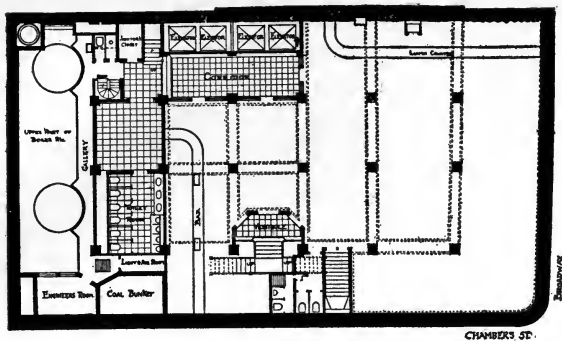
Broadway Chambers, New York City. Basement-floor Plan.
